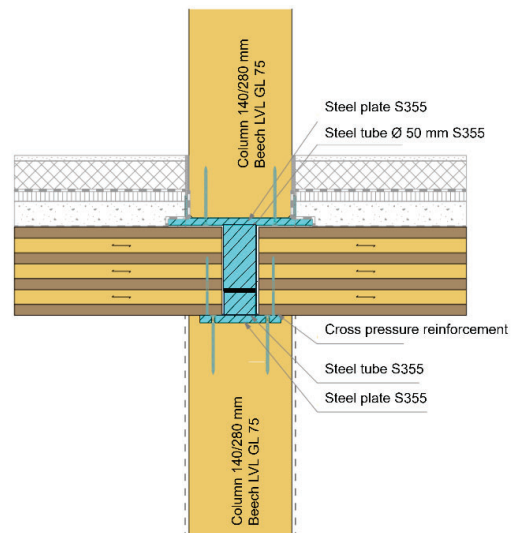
Column joints at the level of the floor slabs with internal steel elements for direct load transfer according to Renggli AG
